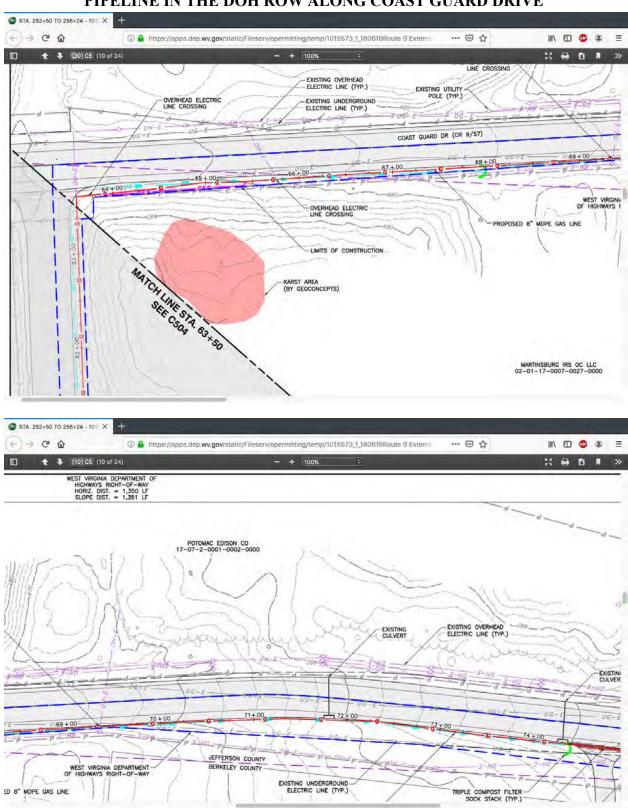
EXHIBIT NN - LONGITUDINAL INSTALLATION OF MOUNTAINEER GAS PIPELINE IN THE DOH ROW ALONG COAST GUARD DRIVE
